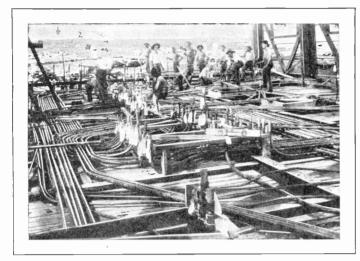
SOME INTRICATE WORK IN CONSTRUCTING THE POWER PLANT—CONDUITS FOR WIRES AND CABLES
